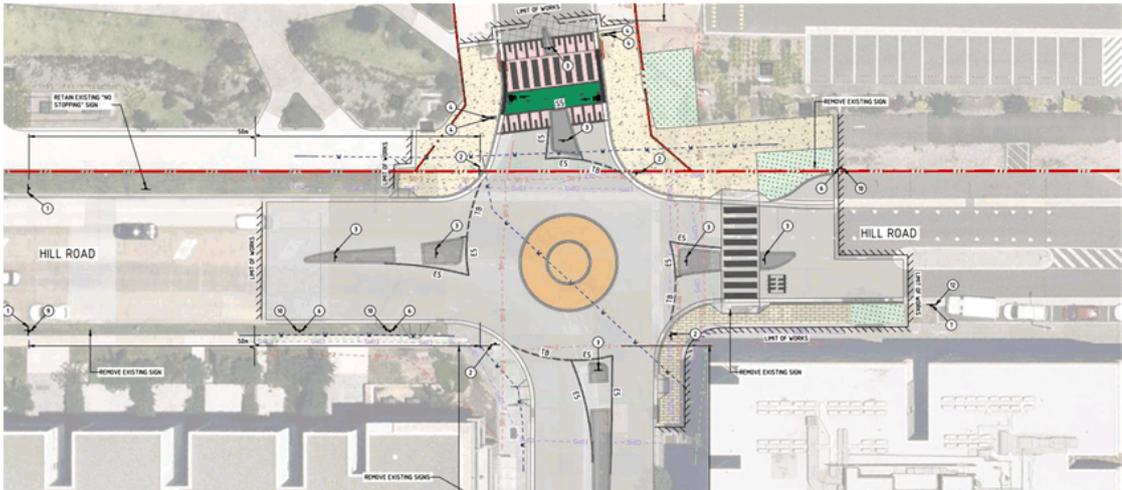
Plan showing the roundabout and pedestrian crossings at the intersection of Hill Road and Burroway Road, Wentworth Point
